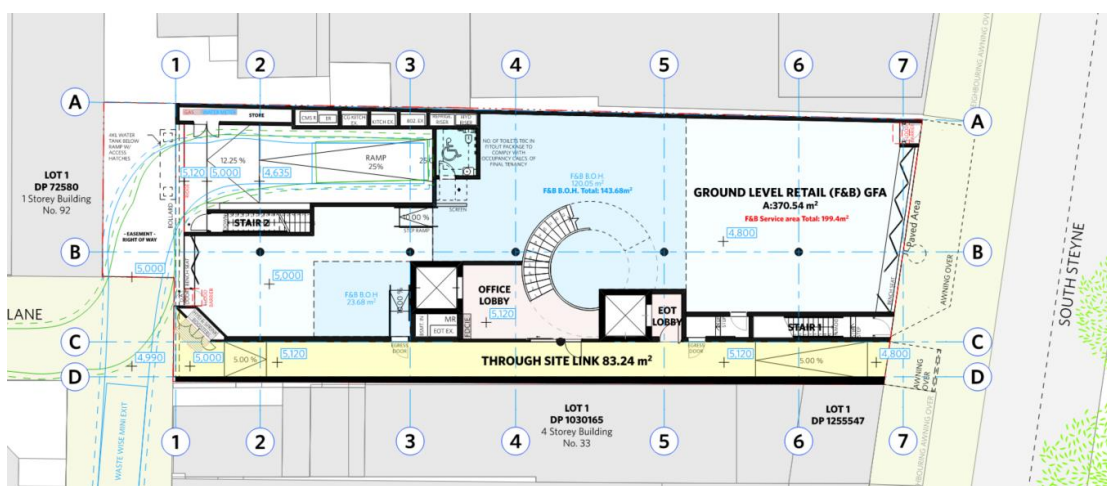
Proposed Site Plan (source: DURBACH BLOCK JAGGERS GA Plan Ground Plan A-DA-110-003 REV DA)
